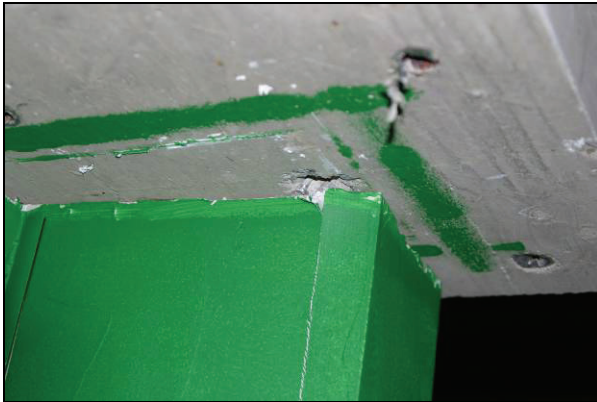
Failure of Transverse Wall Top Track Fastener to Concrete Slab.
